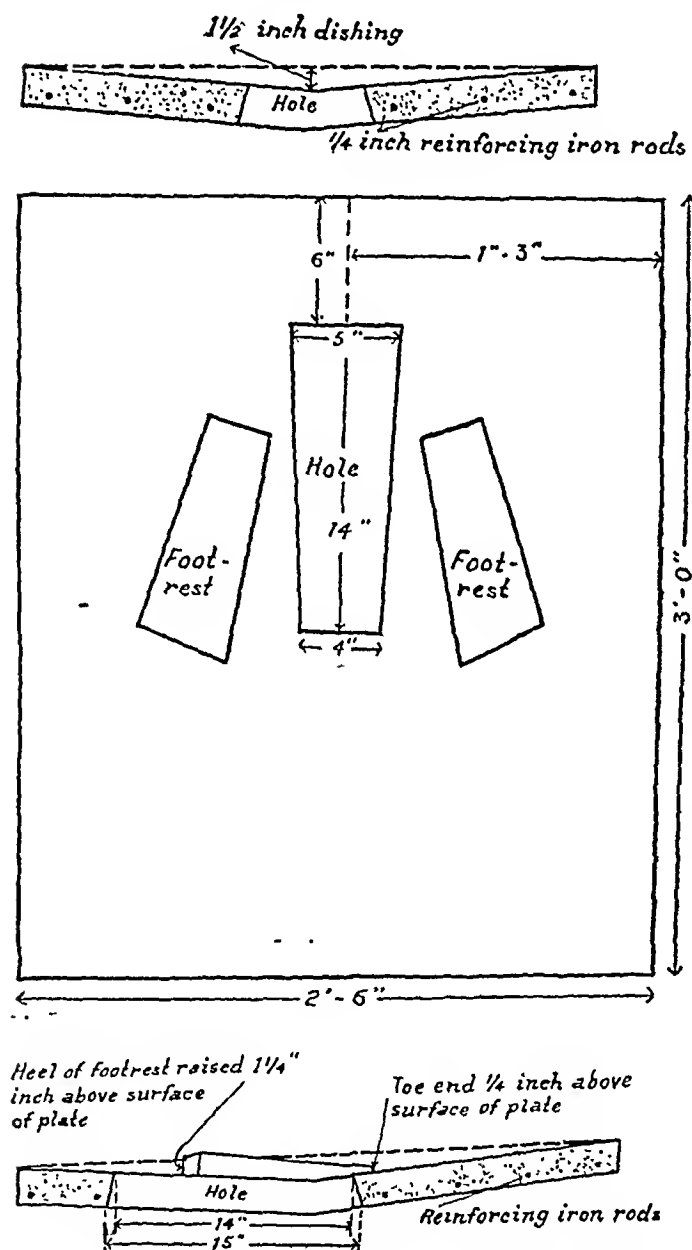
Plan, front and side elevation of squatting plate (after Prasada).
